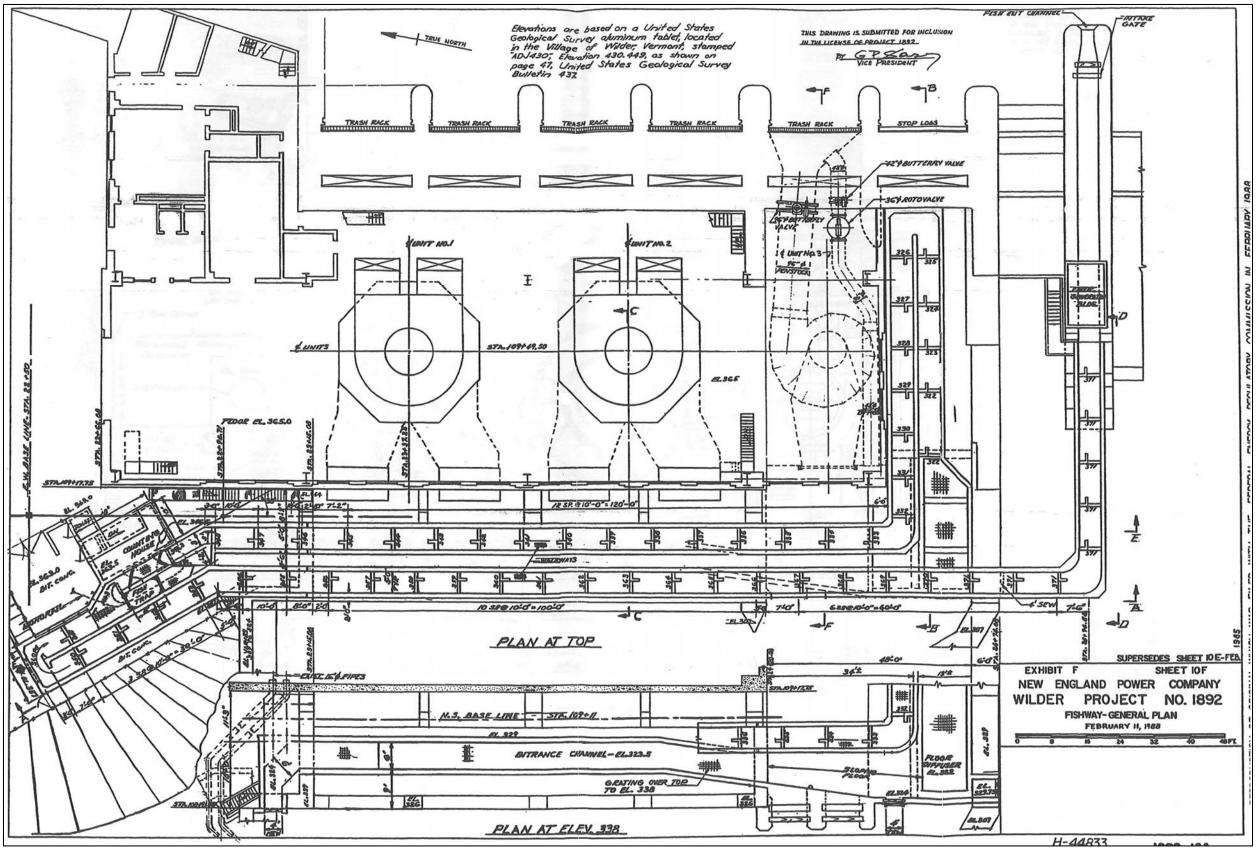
Plan of the Wilder Project Powerhouse and Fish Ladder.
